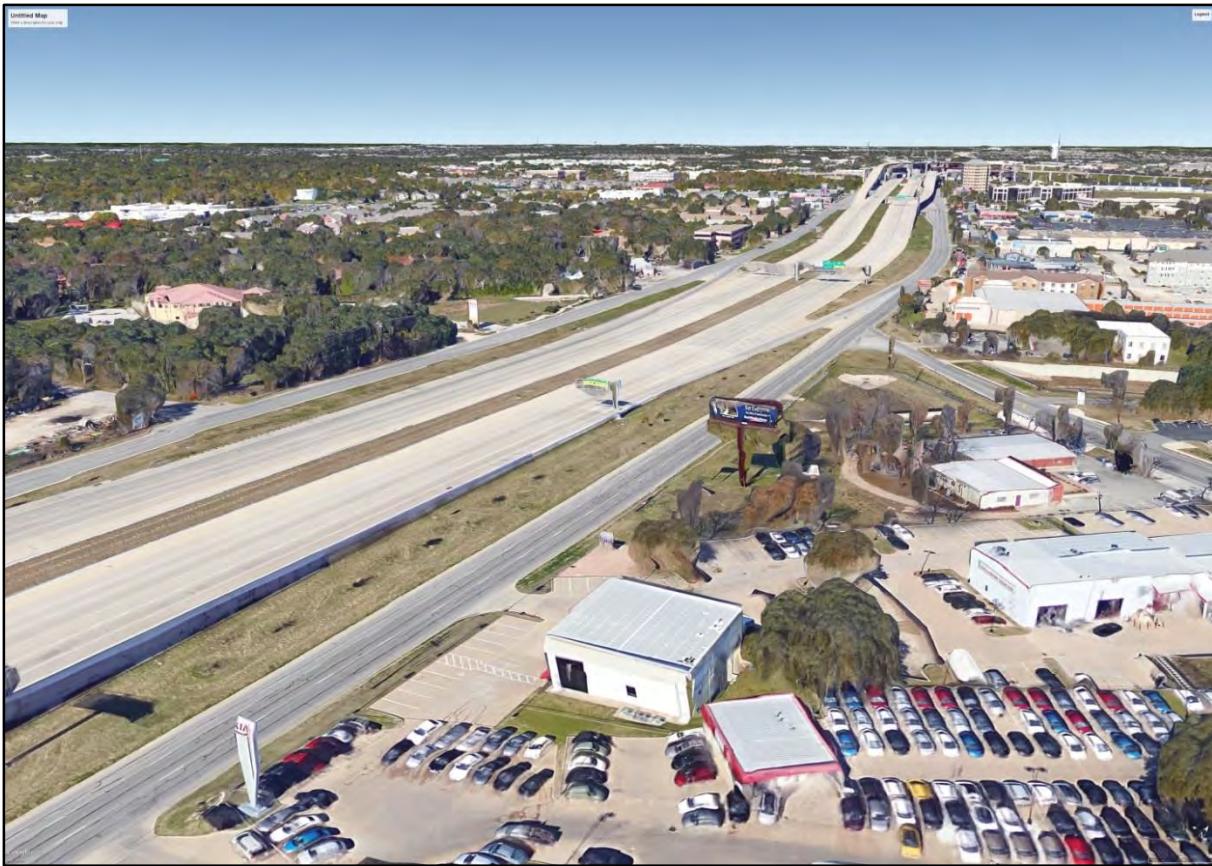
Existing Condition: Google Earth image (birds-eye view) facing north-northwest of the northern intersection of US 183 frontage road and Pond Springs Road. Direct connectors to RM 620 are in the background.
